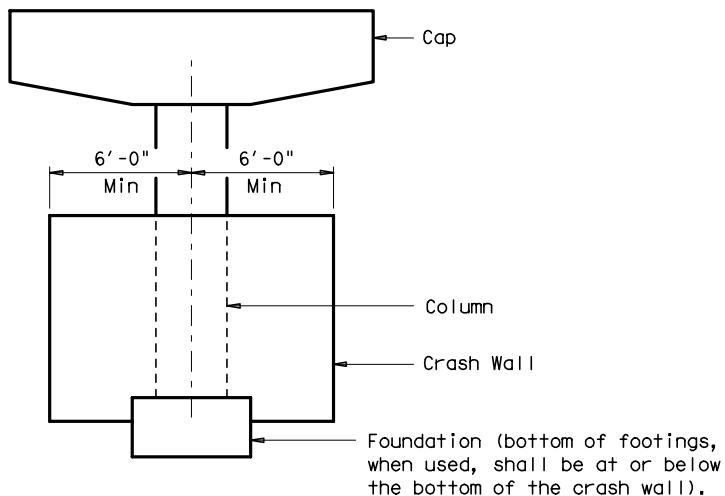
Railway Crash Wall Parameters for Single Column Bent. Online users can click 4-12 to view this illustration in PDF.
